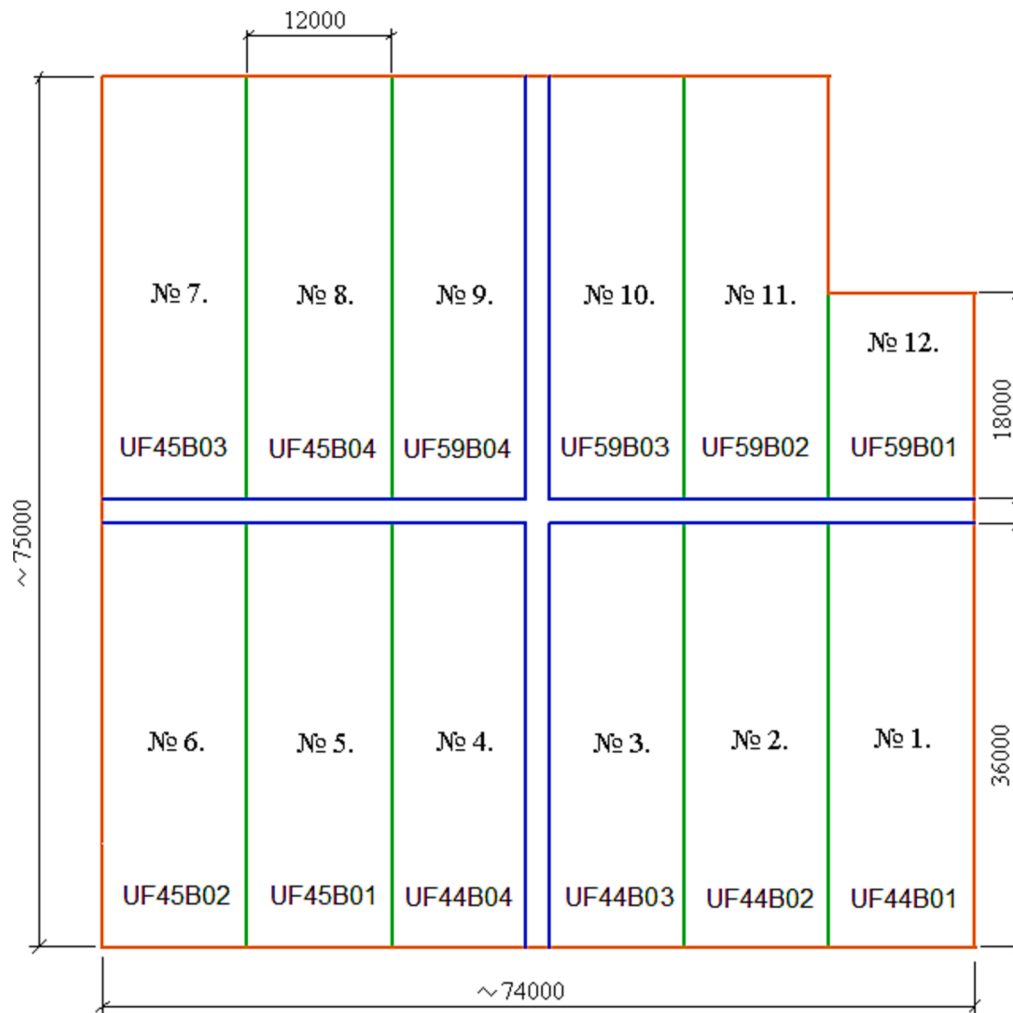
Layout plan of canyons of bituminised radioactive waste storage facility.
